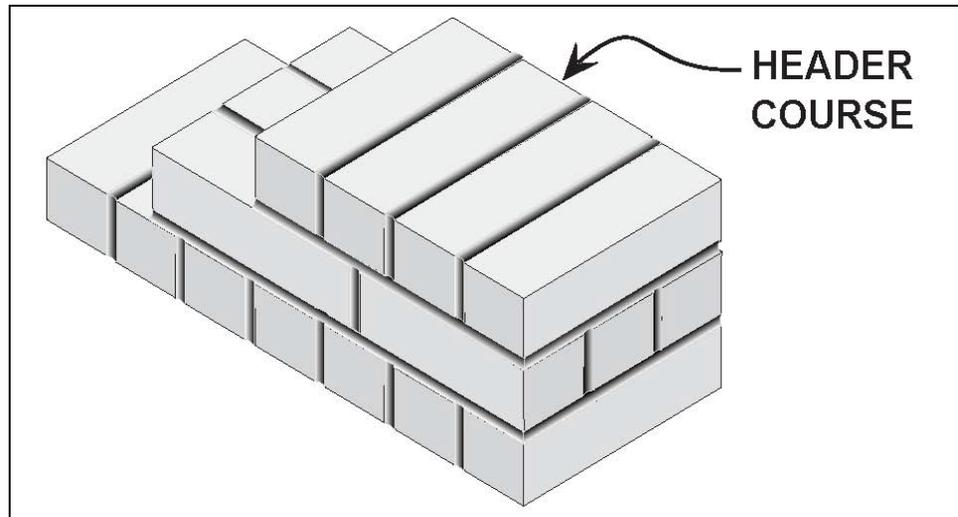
Brick Manhole, Inlet, or Catch Basin
